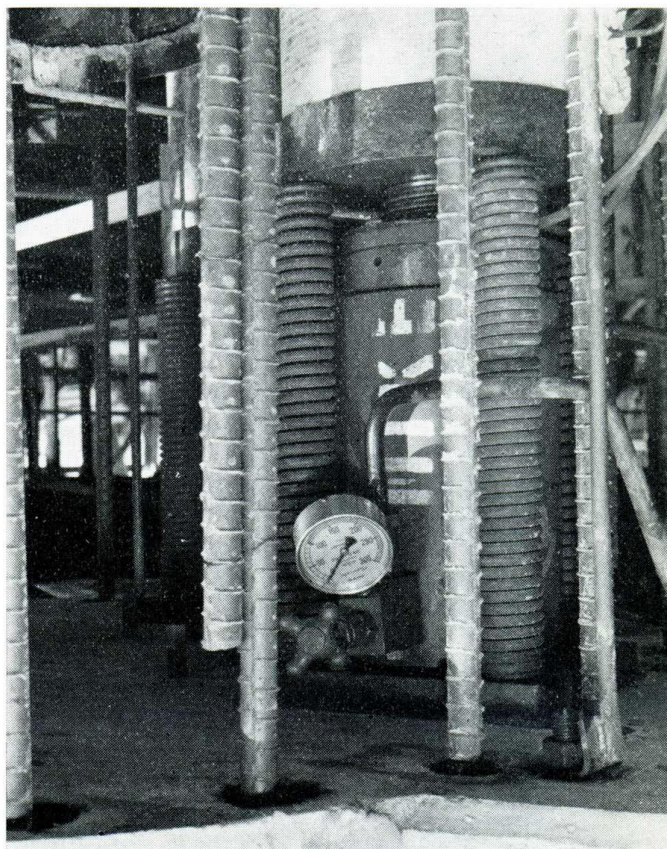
Construction of elevated water tower at Fredriksdal. Jack for lifting the reservoir from the ground
